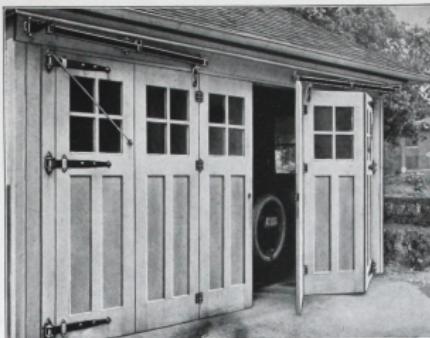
Exterior view of garage doorway equipped with "Slidelite" six-door No. 1035 hardware, applied to doors opening out. Two car garage.
